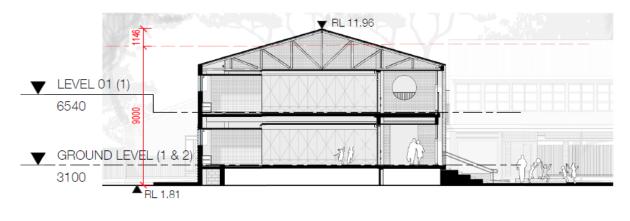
Builling 1 - Extract of Section Plan prepared by SJB Architects.
